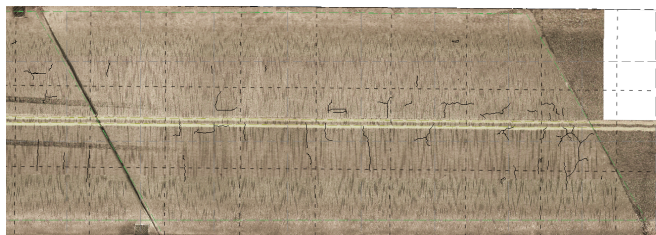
Existing Cracks of Bridge Deck No. 22383-Span 3
